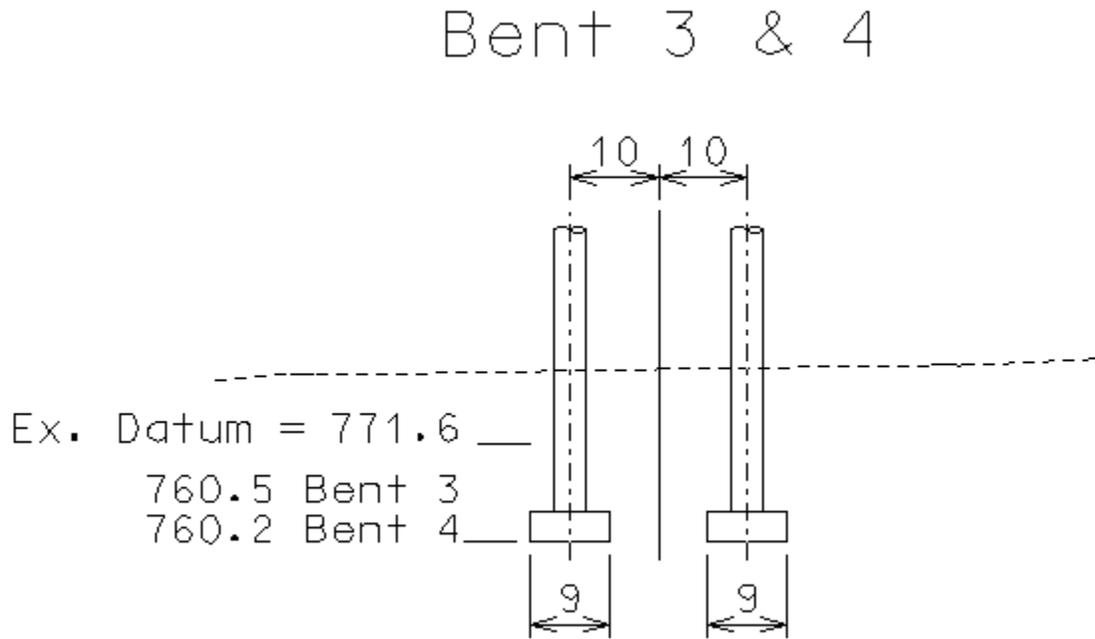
6 Excavation Limits: Stream Crossings (Typical)
